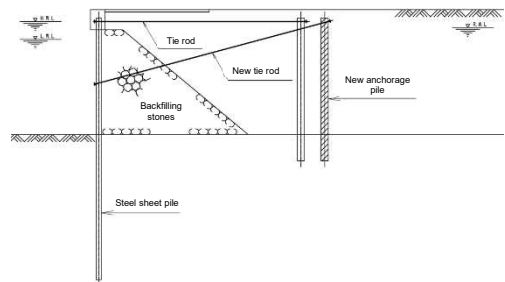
Example of a construction method that supports sheet piles (S-9)
